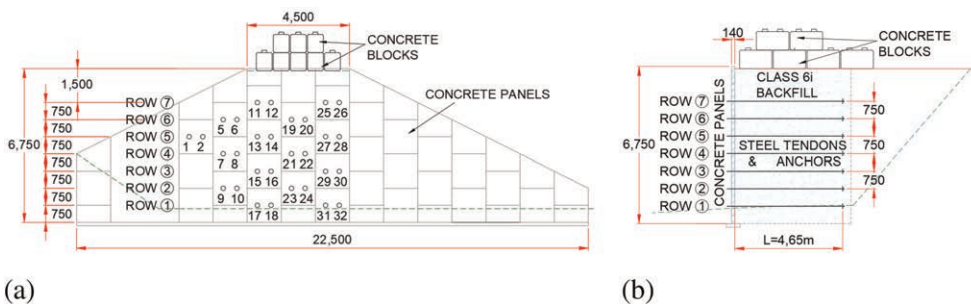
(a) Front elevation of test wall and (b) Cross section through the test wall.
